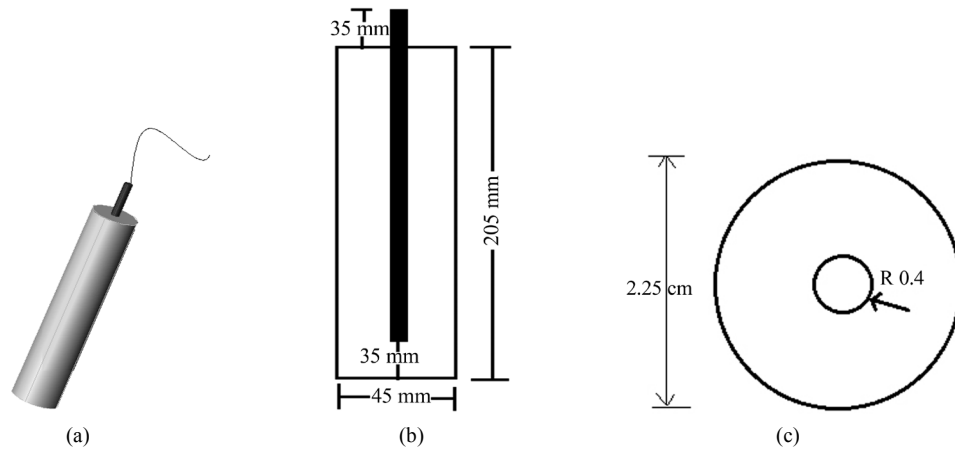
Specimen design and dimensions: (a) sample; (b) side-view; (c) top-view.
